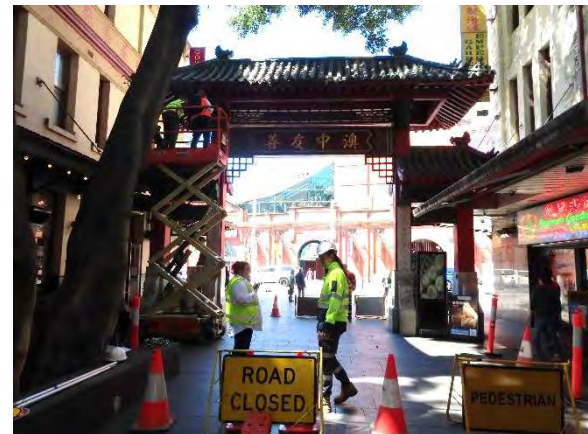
North elevation (image taken facing south with Paddy's Markets in the background).
